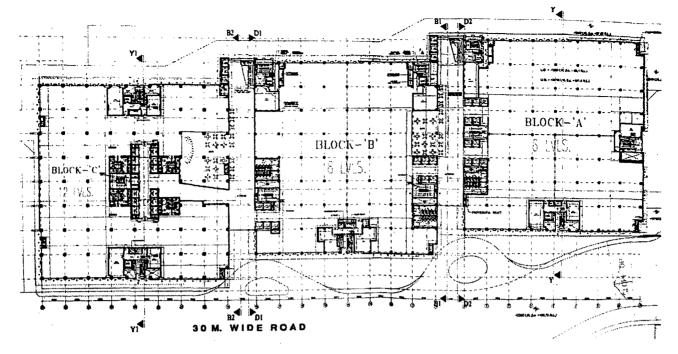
Ground floor plan of Tower 8 Source: DLF Architectural Section
